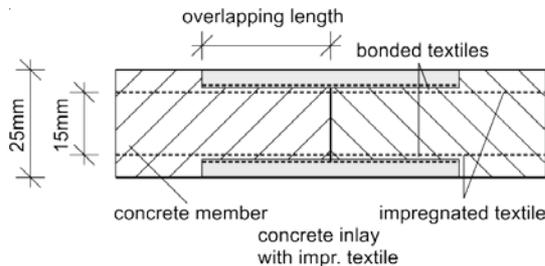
Geometry of the key and slot joint with a concrete inlay
